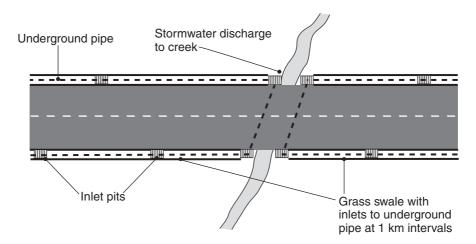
Plan illustration of swale drain/drainage pit option.
